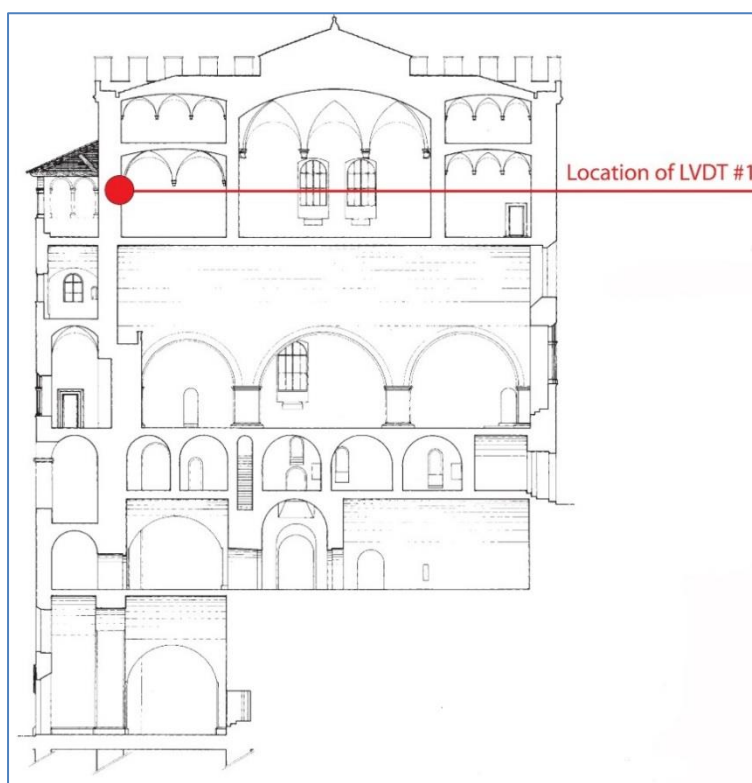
Position of LVDT#1 for the static monitoring of the south wall
